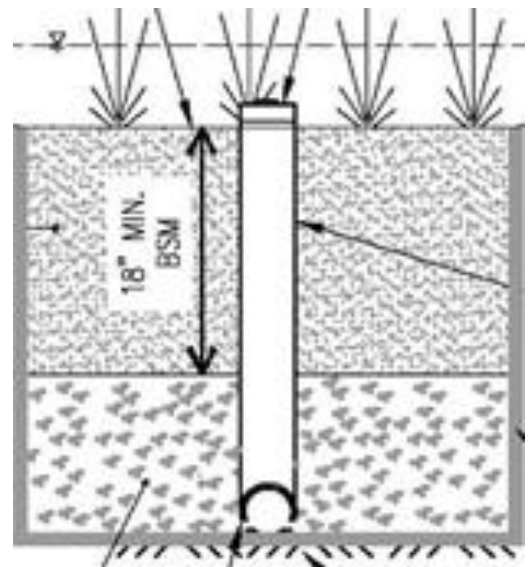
Underdrain Pipe Detail Location with no infiltration
